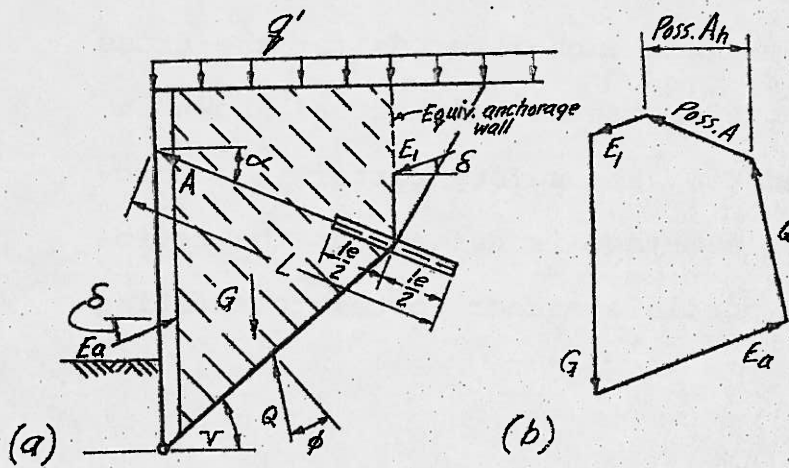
Determination of stability for the lowest failure plane - injection anchor system.
